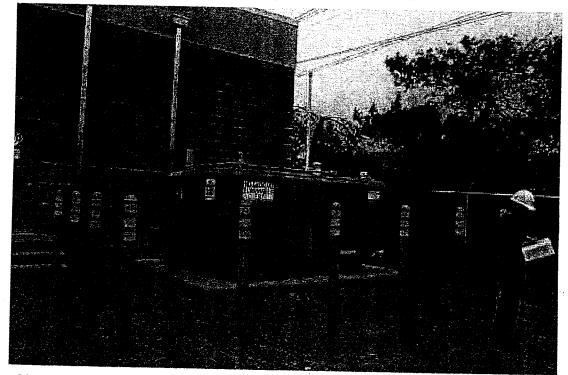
Conforming Contemporary Above Ground Storage Tank (AST) at Project Site.
